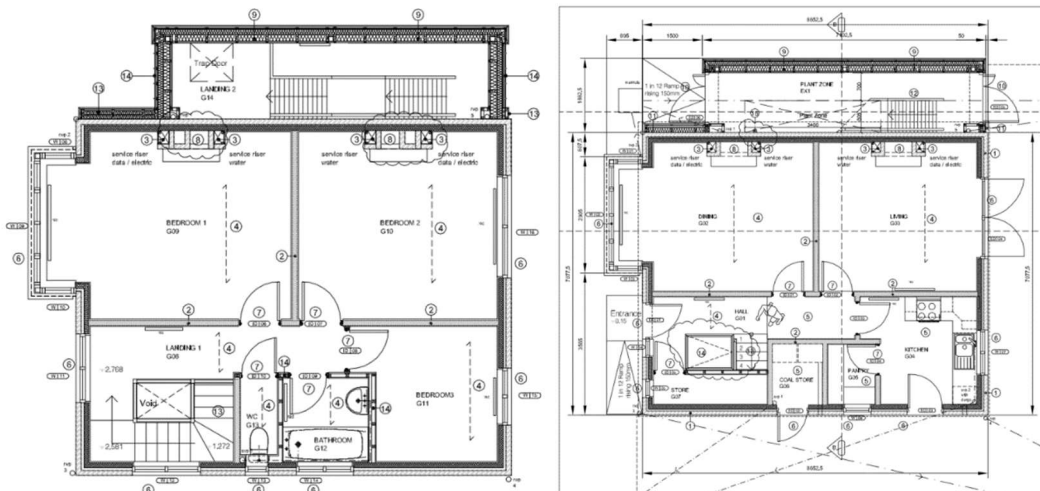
The PDF drawing of first floor and ground floor in E. ON house
